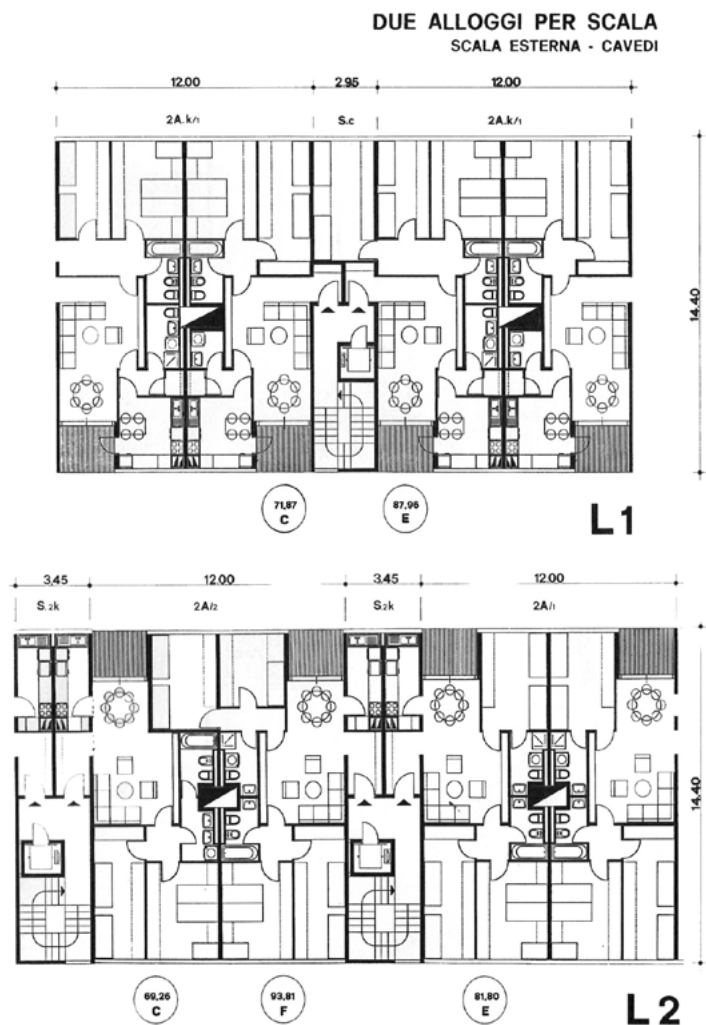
Standard aggregation of dwellings characterized by parallel r.c. walls: the layout of the dwellings is limited by the presence of transversal structural walls
